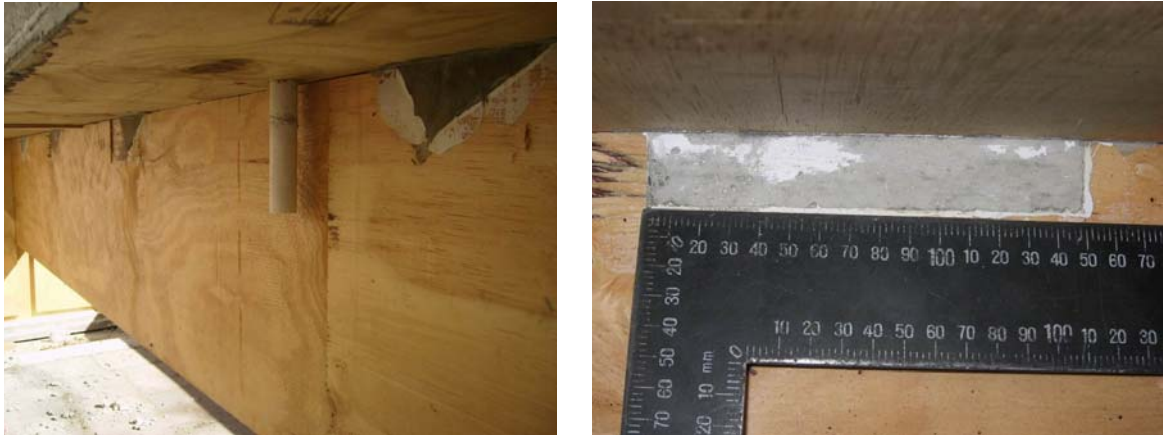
Notches visible under side of beams, triangular notch (left) and rectangular notch (right)
